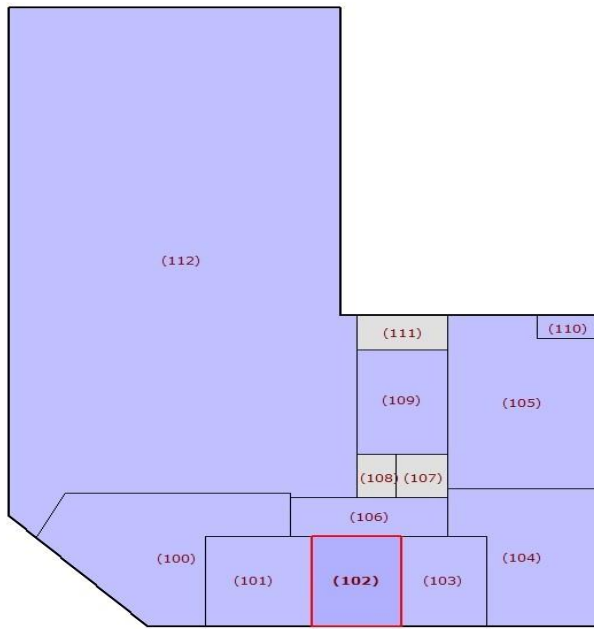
TOP VIEW AND DIVISIONS OF THE OFFICE BUILDING
